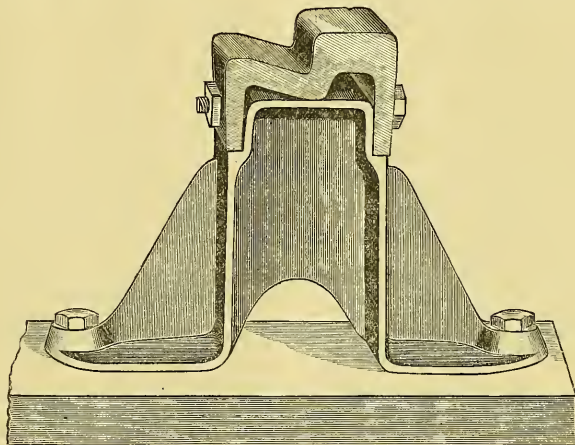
WHITE'S DOUBLE-GIRDER STREET-RAILWAY RAIL.
